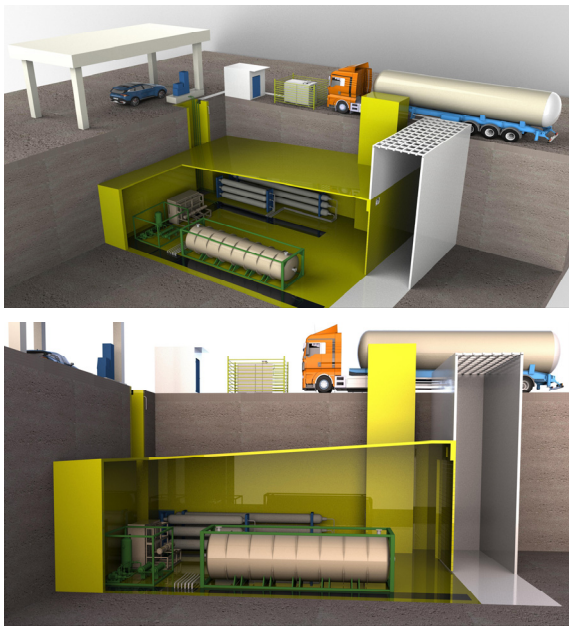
Design Plan for Underground Liquid Hydrogen Refueling Station
